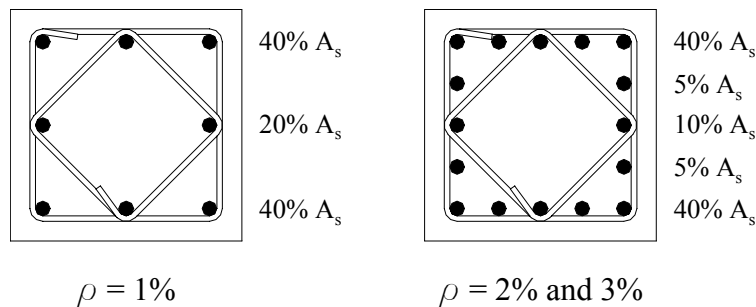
Assumed arrangement of reinforcing bars for parametric study
